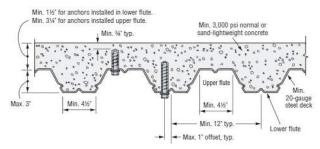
Installation of %"- and ½"-Diameter Anchors in the Soffit of Concrete over Metal Deck
